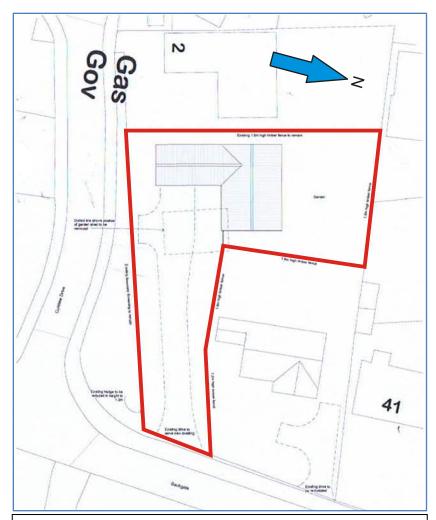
Block Plan Showing the Layout of the Proposed Development at an original scale of 1:200, (not to scale), (extract from Architects plan). The site is shown outlined in red.
